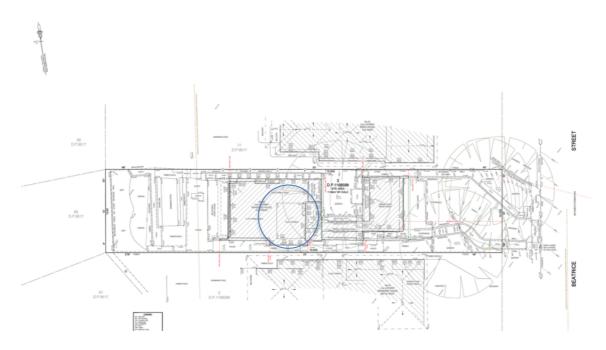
Survey noting spatial arrangement of built forms and location of terrace
